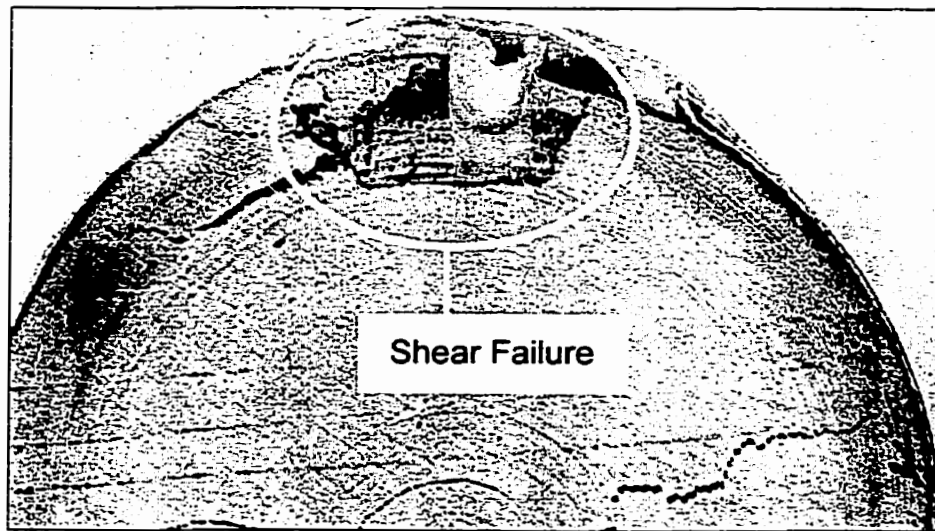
Cross-section of specimen P3-4-406-3 after failure.
